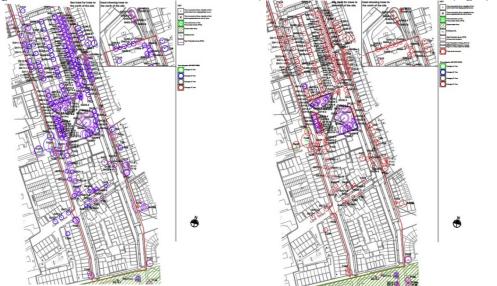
Phase 1 Tree Constraint Plan (left) and Tree Protection Plan (right) (2011)
